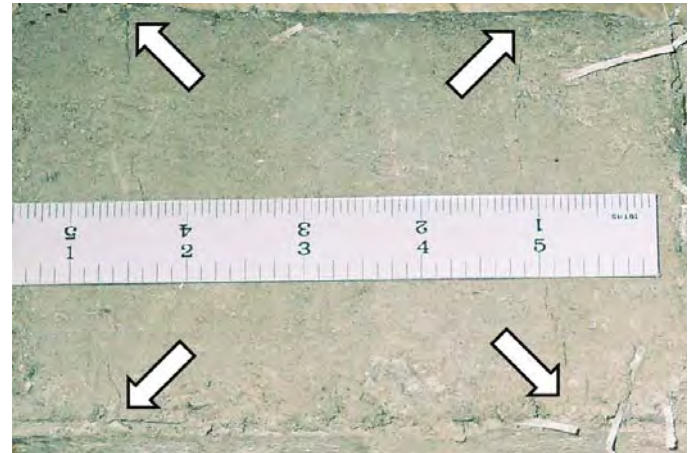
Shotcrete Partial Beam Test Specimen Showing Dual Sided Failure Cracks.
